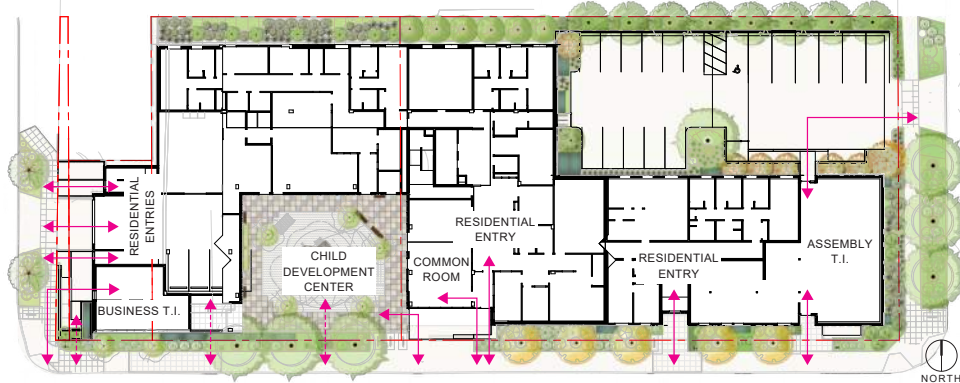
Plan showing locations of entries and strong visual connections. General layout of building massing is also apparent.
